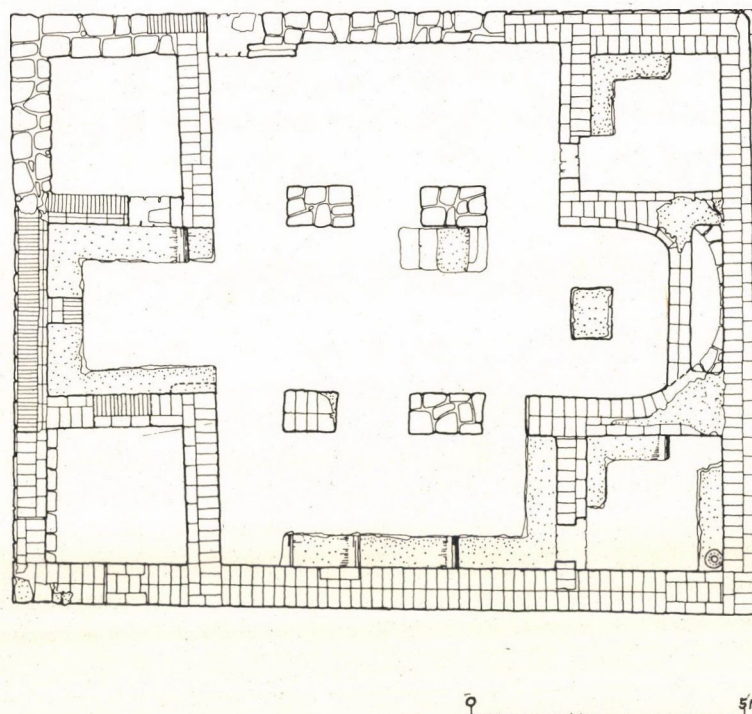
Abdallah Nirqi, ground-plan of the Southern church
